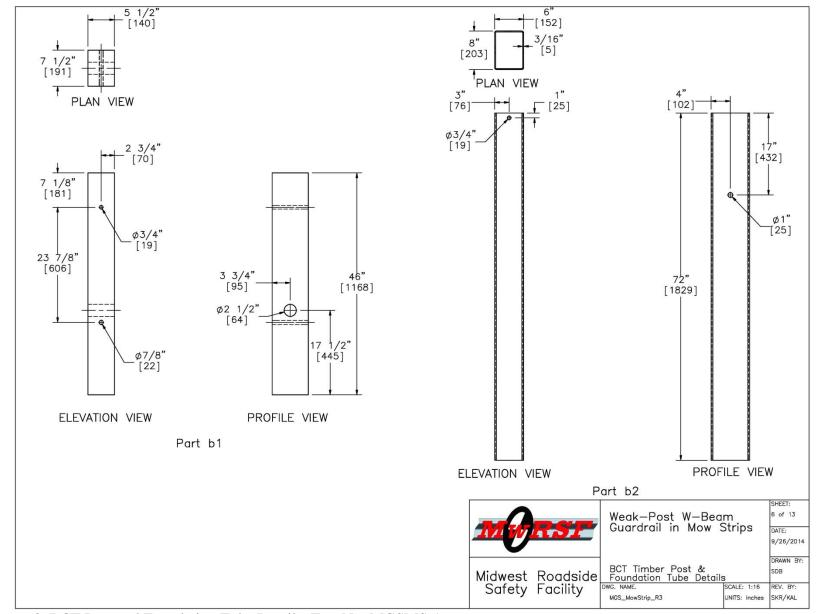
BCT Post and Foundation Tube Details, Test No. MGSMS-1
